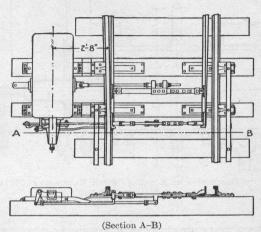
Single Switch Operated by Model 4 Switch Machine
